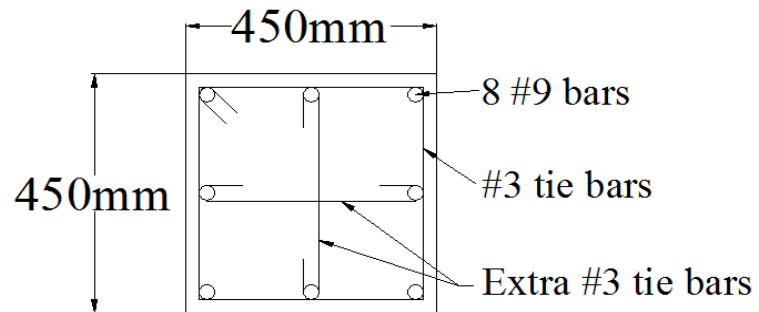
Column Cross-sections of CC and CEX bottom 4 floors
